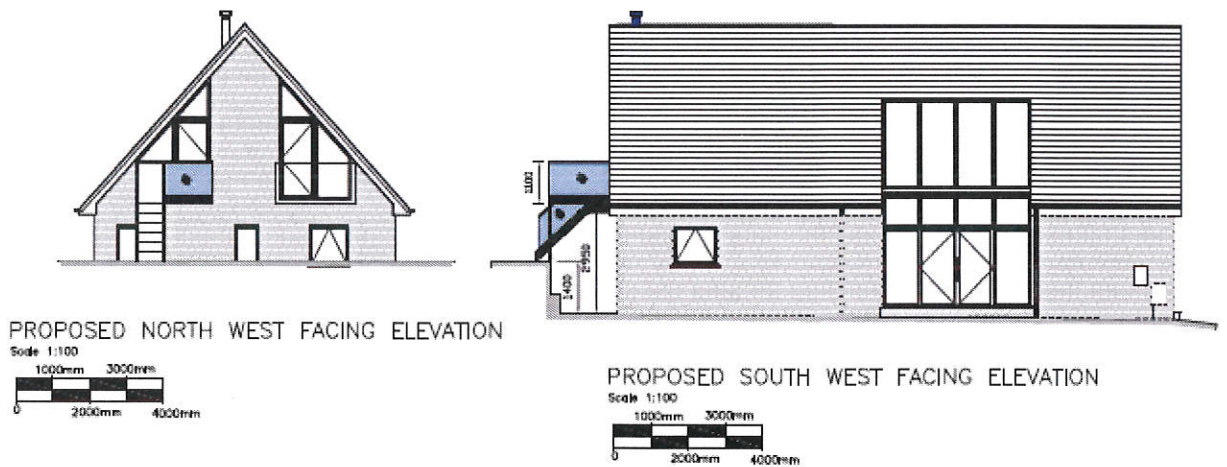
extract from approved drawing No: TS9185/01 Rev A, received on 6th September 2022 pursuant to planning application 10/22/0885 – proposed rear and side elevations.
